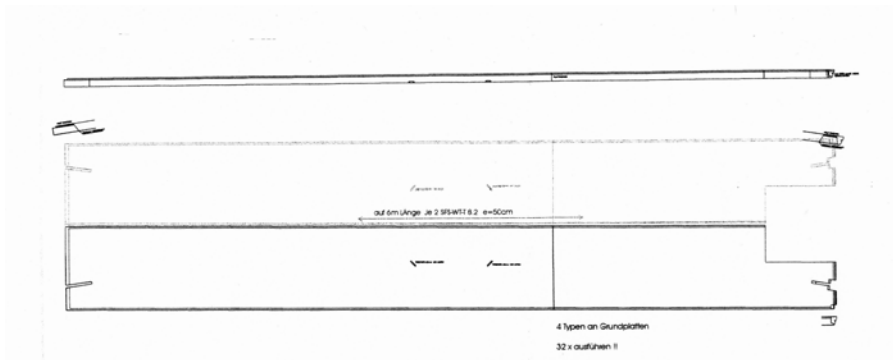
Design of the four plates forming an element, with cuts for lantern and plate-rod connections.
